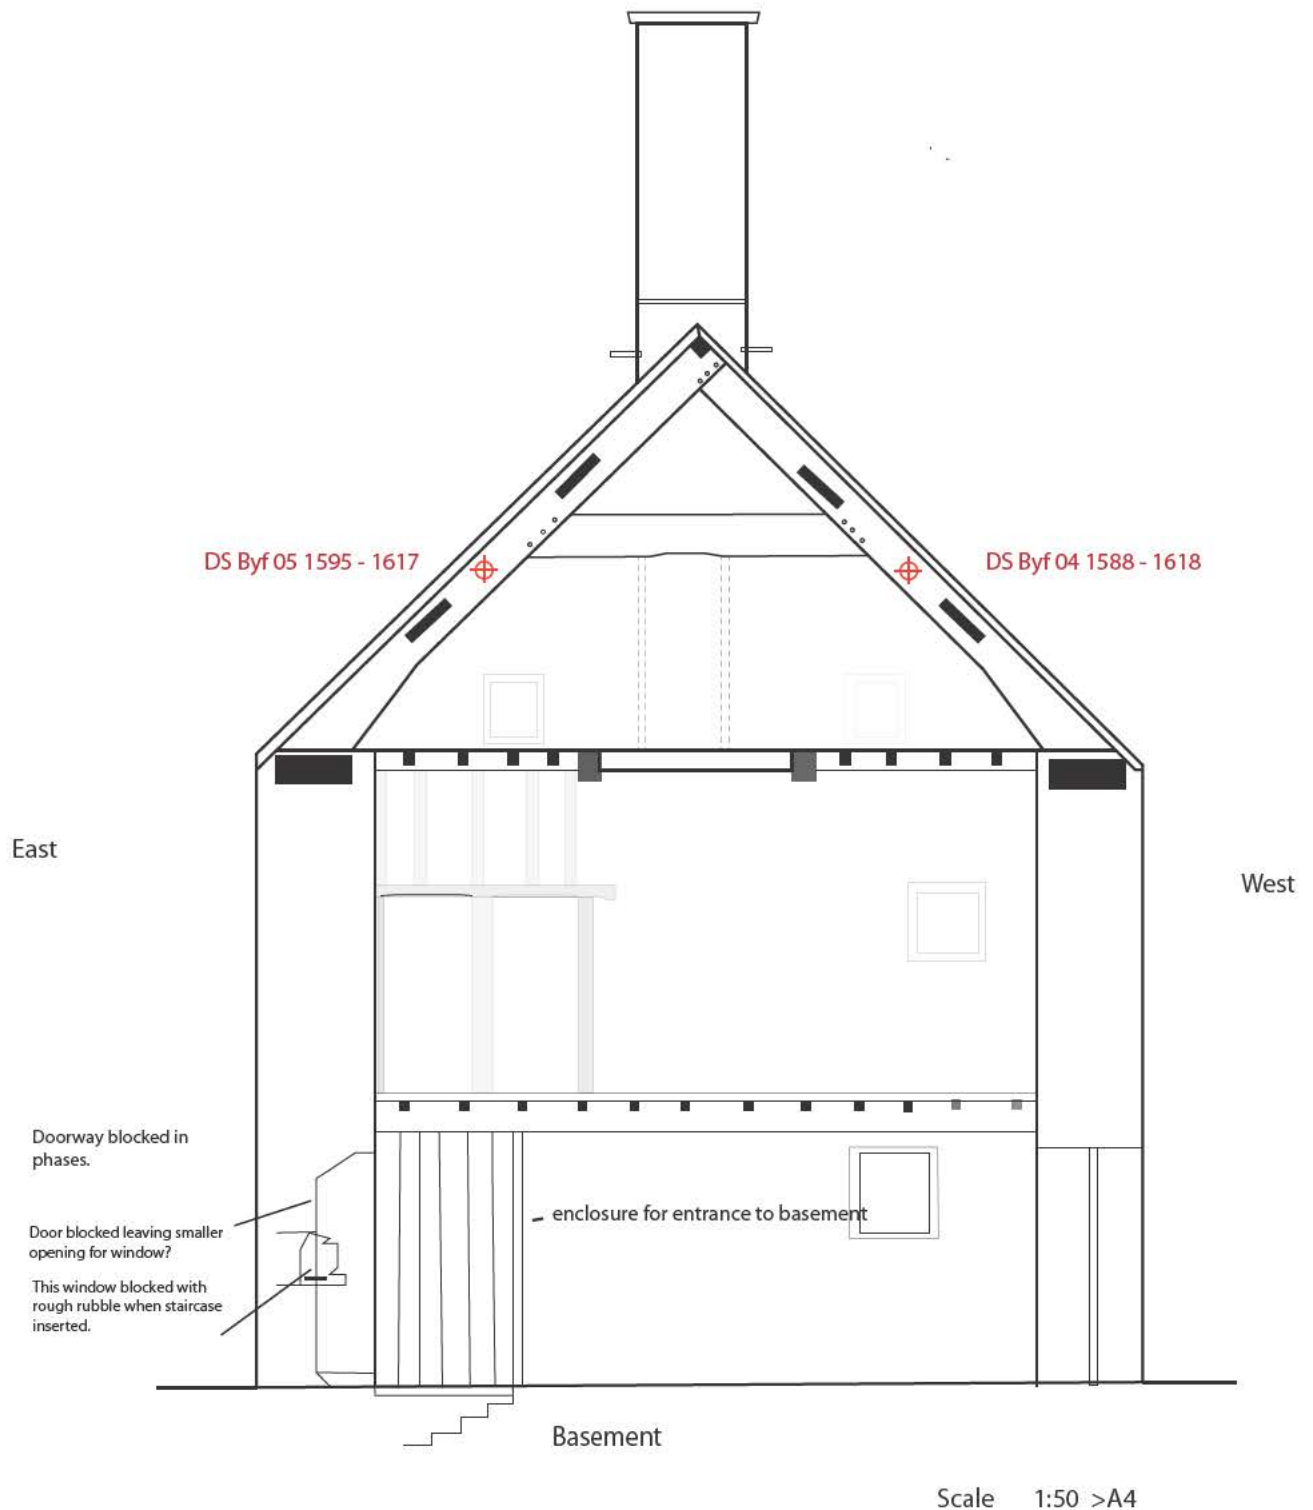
Section BB looking south. Truss 2 - principal rafters with collar
